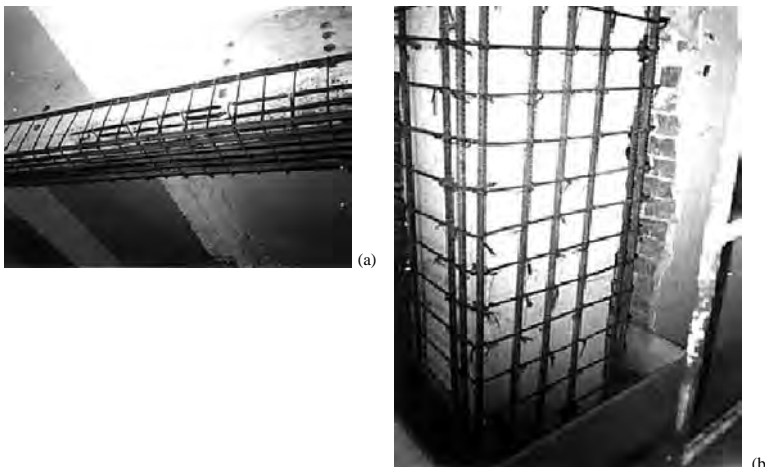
RC strengthening of: (a) main girder; (b) column
